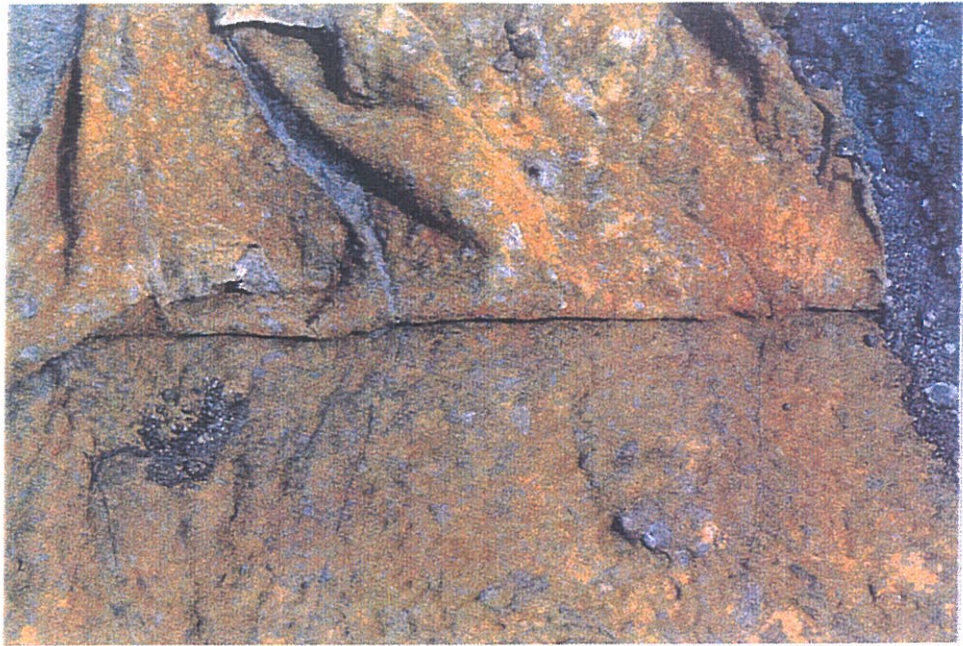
Geotextile folded back exposing the heavily iron stained geotextile underside and subgrade, testpit 1a.
